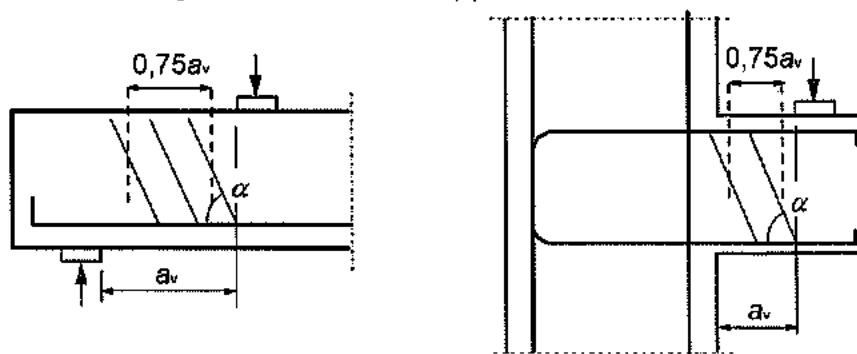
Shear reinforcement in short shear spans with direct strut action
